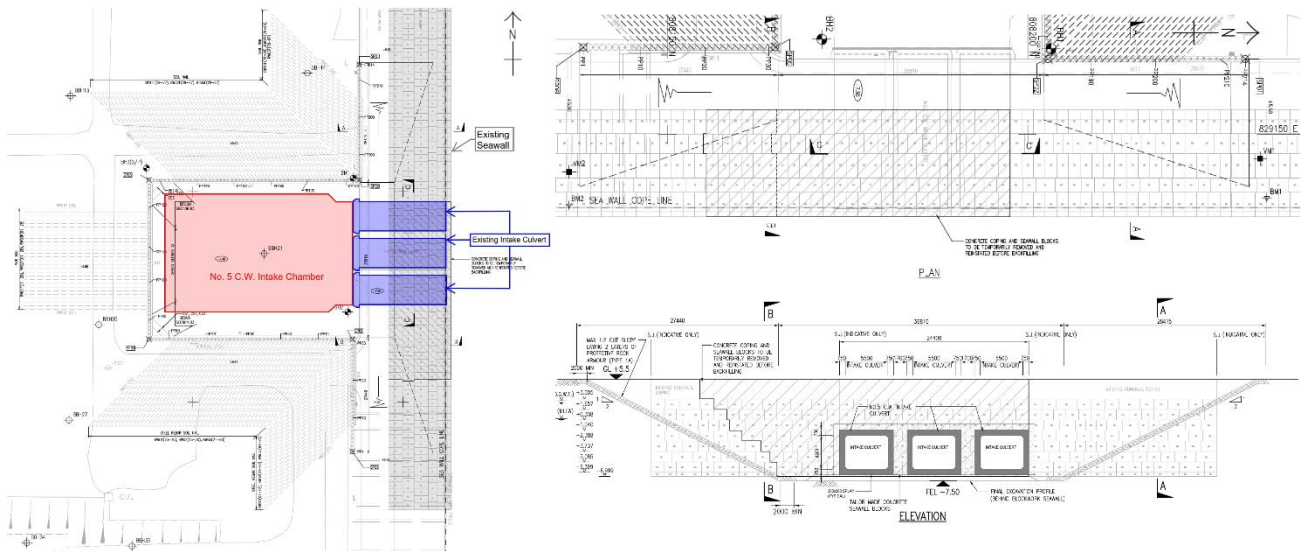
General Arrangement for the ELS Design Layout and Seawall Opening
